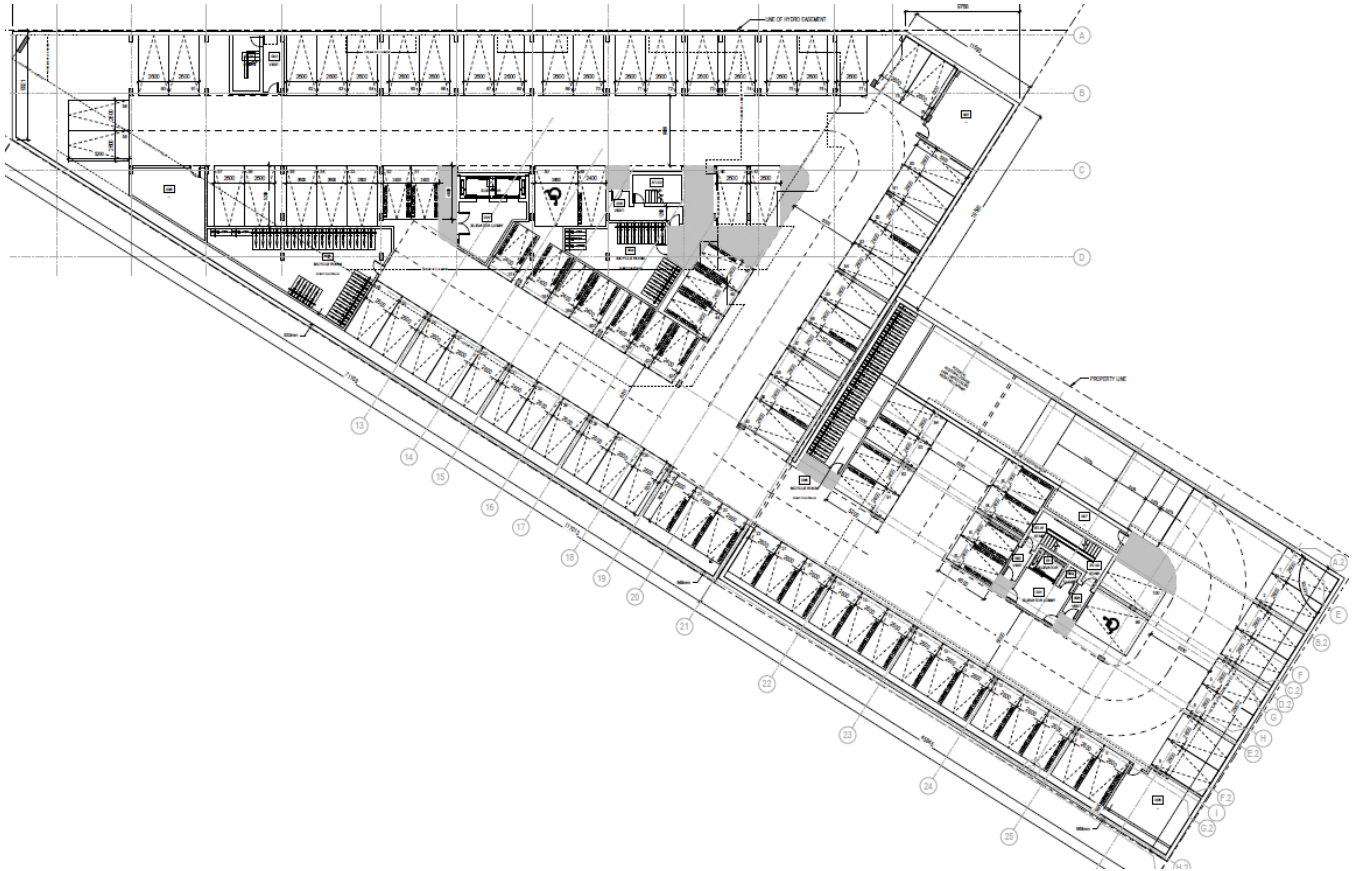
Excerpt from the P1 Level Floor Plan of the Proposed Development
